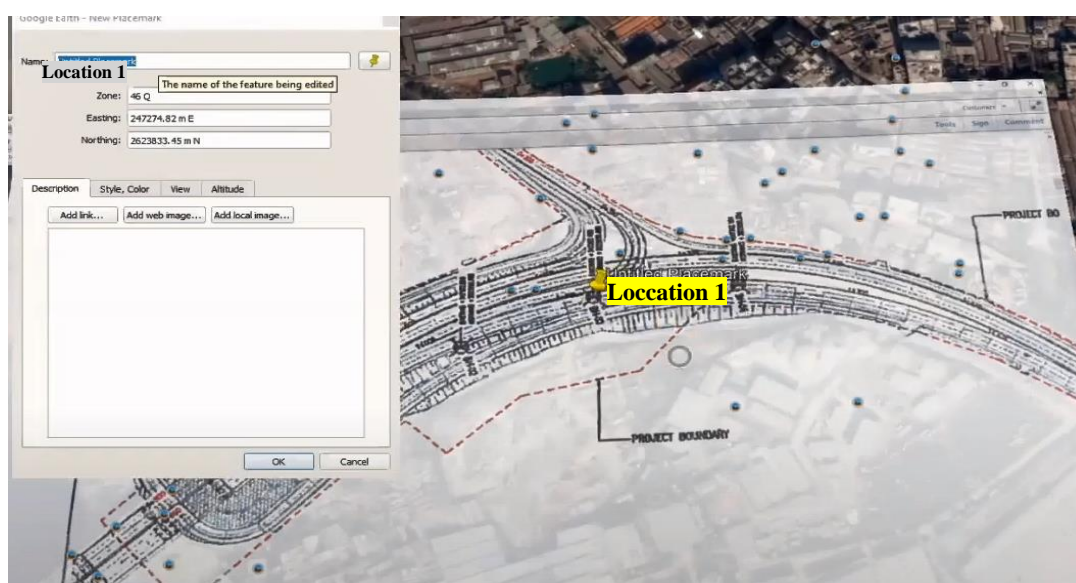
a: Kanchpur, Meghna, Gumti 2nd Bridges Construction and Reconstruction of Existing Bridges – Location 1
